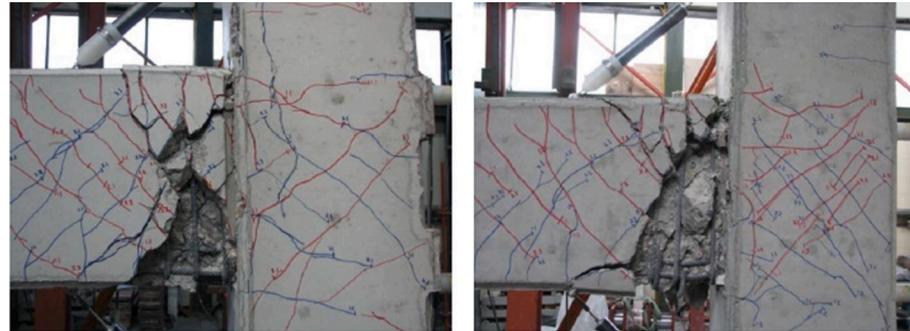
Shear failure of RC beam-to-column joints [565].
